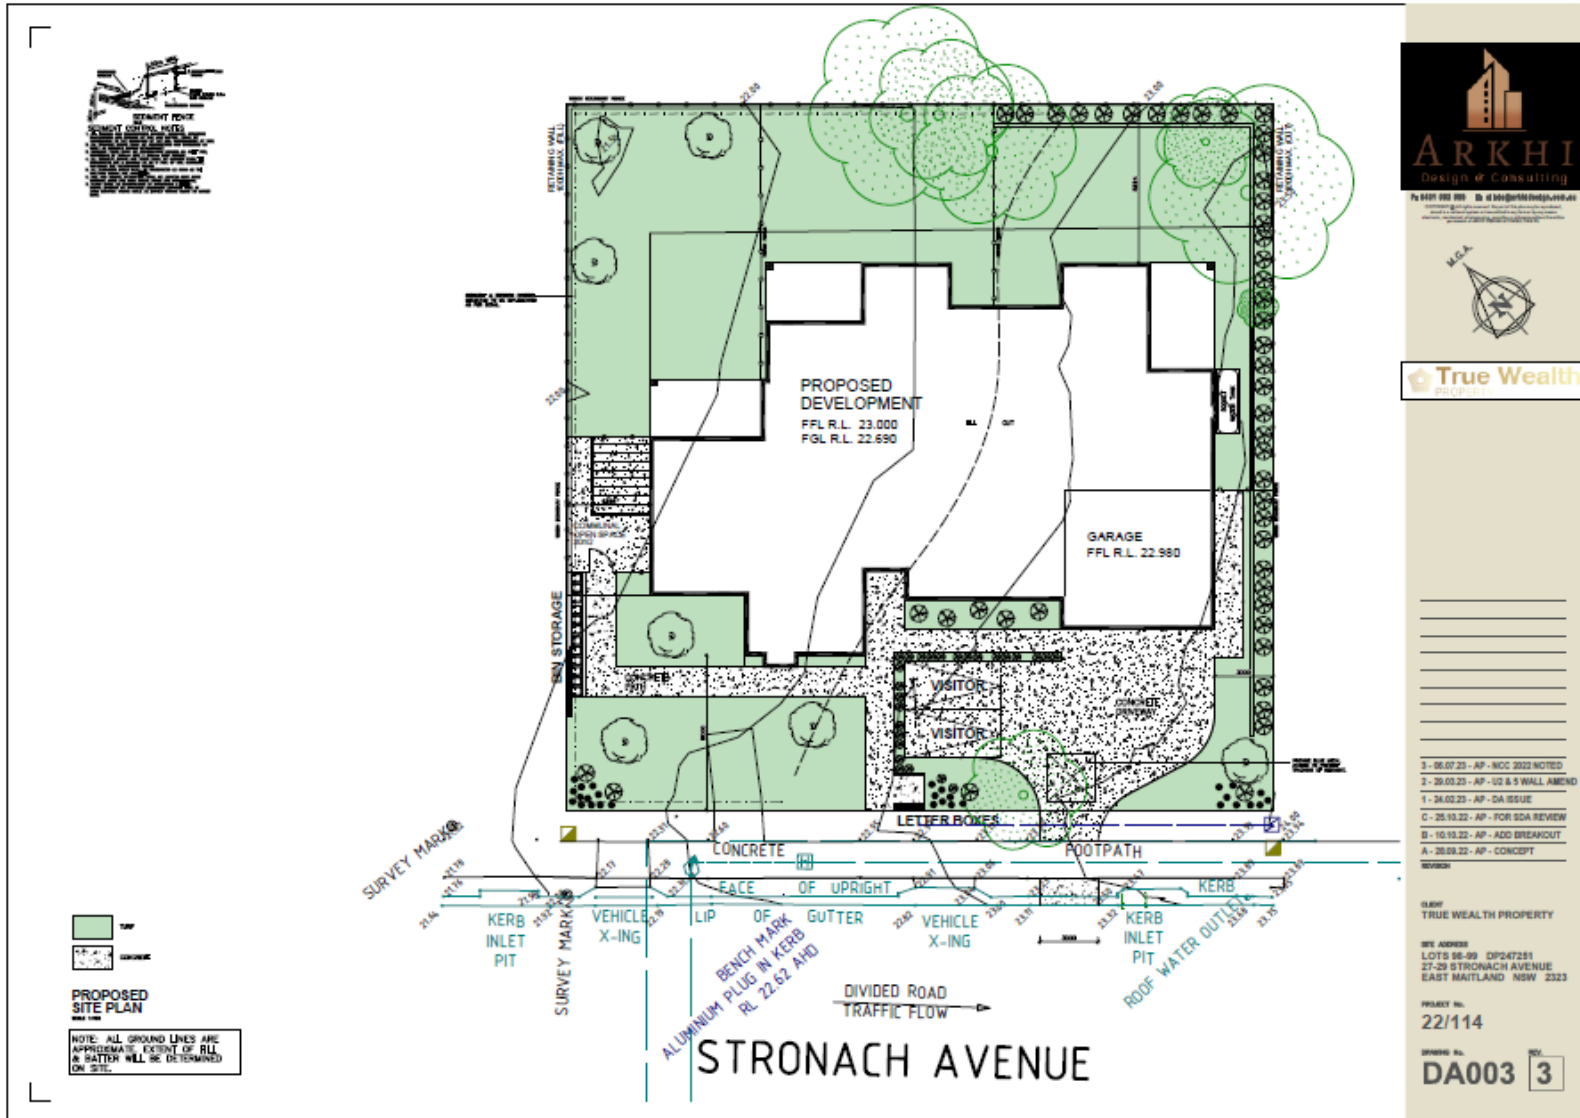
Proposed Ground Floor Group Home (Source: Arkhi Design & Consulting, 2023)
